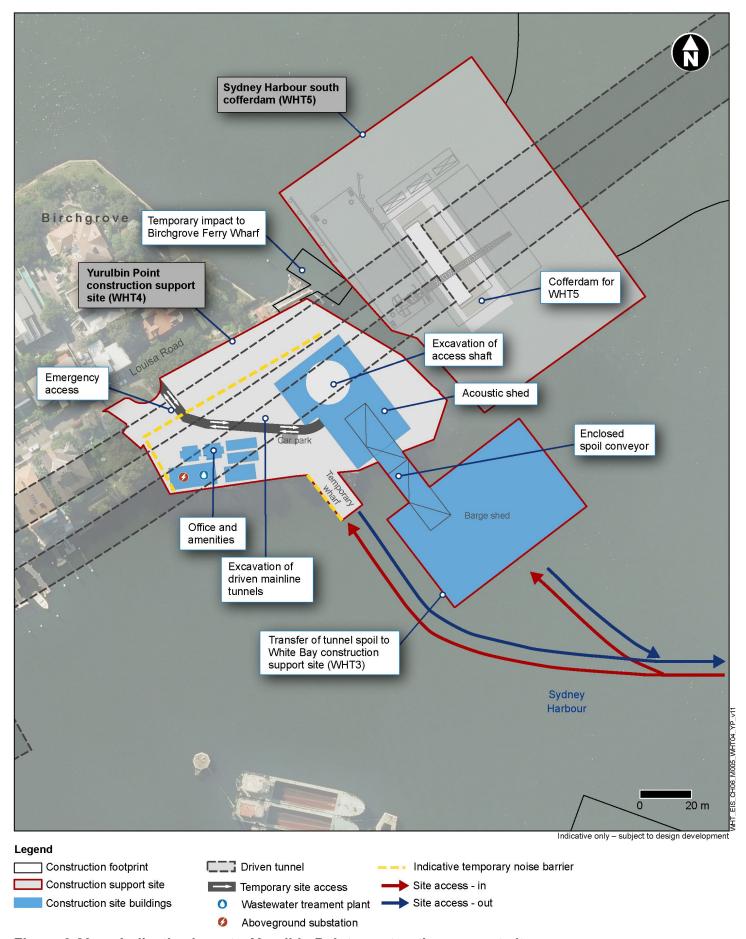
Indicative layout – Yurulbin Point construction support site
